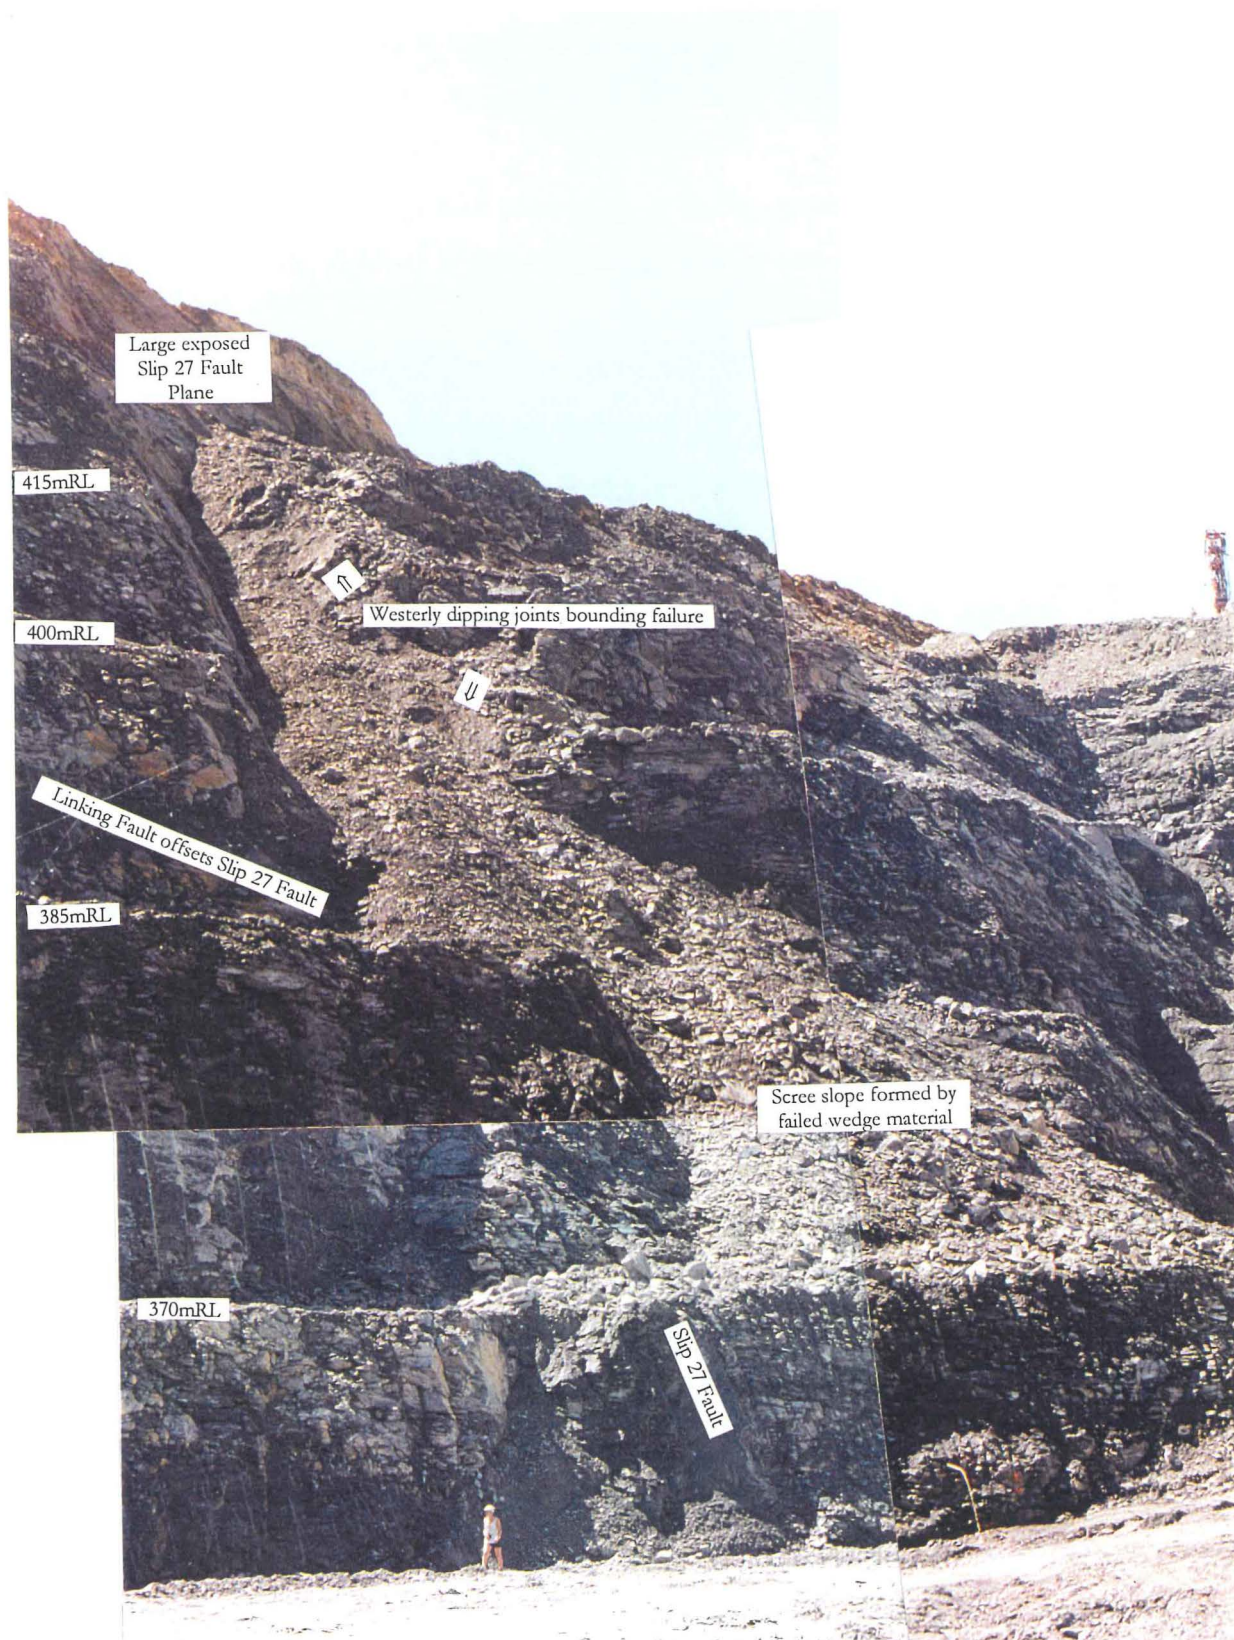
View of failure RH27 from Round Hill Pit Floor
